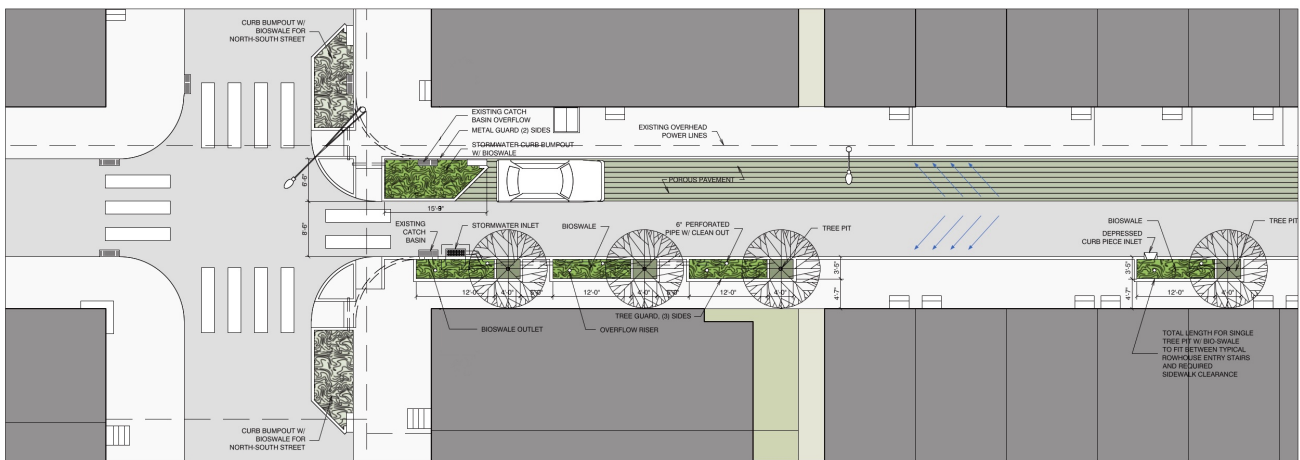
Model 1—Plan view of “gateway” arrangement of GI near the crosswalk and intersection.
